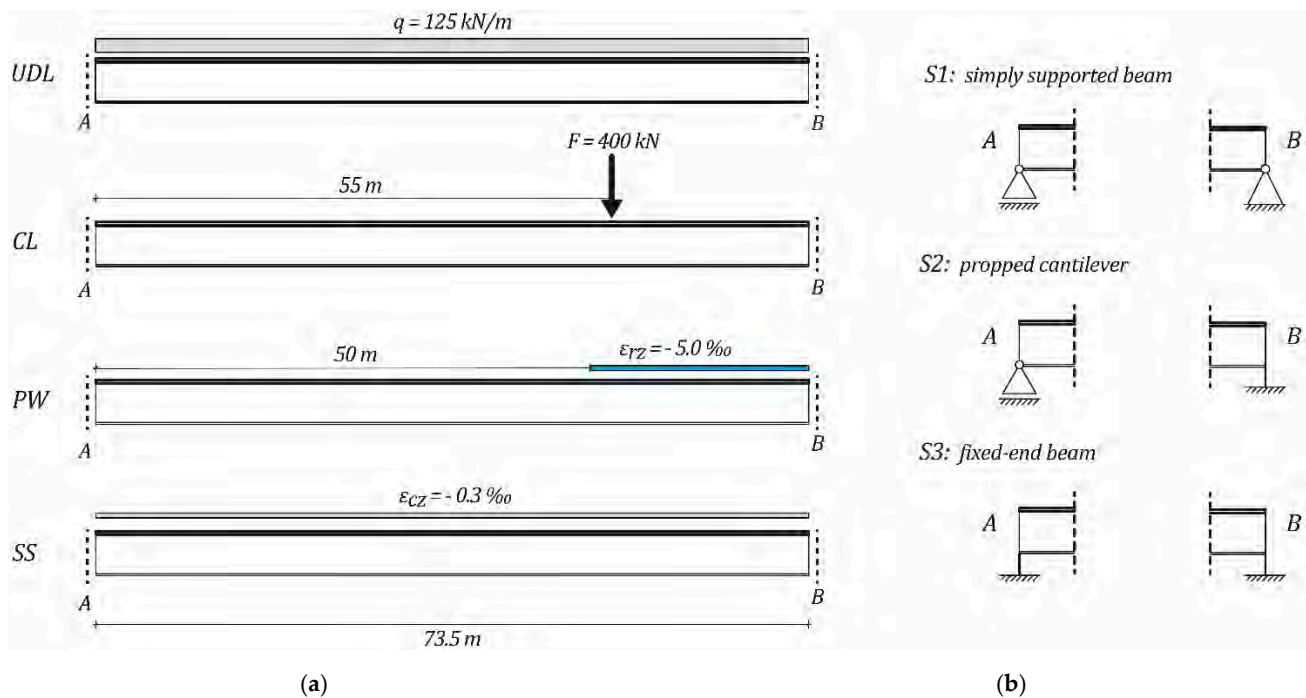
(a) Load conditions and (b) static schemes considered in the applications. UDL, uniformly distributed load; CL, concentrated load; SS, concrete slab shrinkage; PW, prestressing of wires in the concrete slab.
